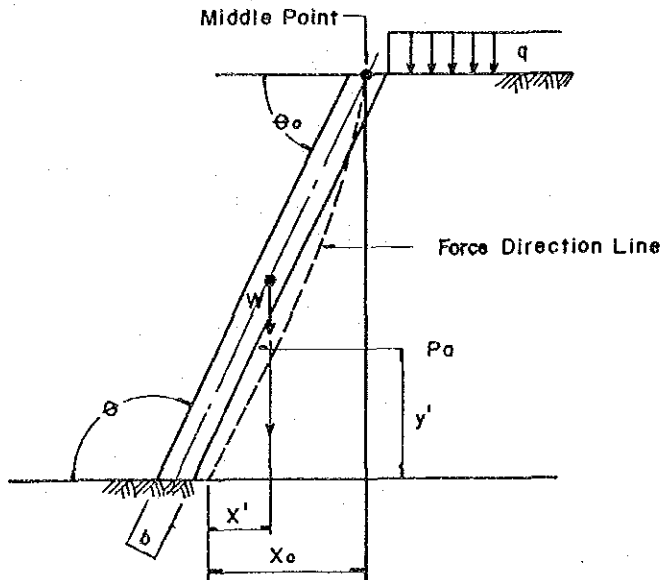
SLOPE STABILITY OF RIPRAP RETAINING WALL
